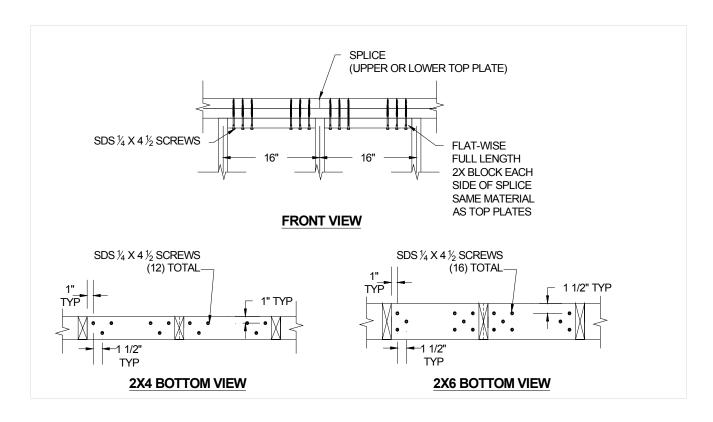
TOP PLATE SPLICE: BENDING REINFORCEMENT (SPLICE CENTERED OVER STUDS)
